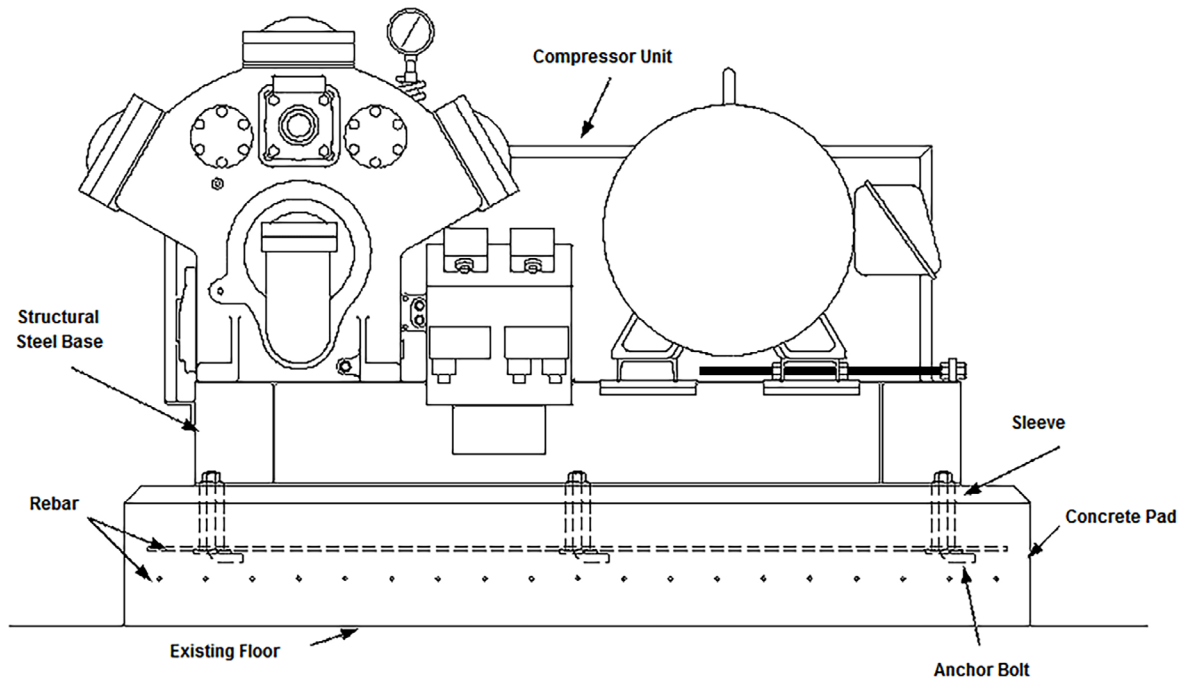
Typical Ground Floor Installation (VMC Compressors with Structural Steel Base)
